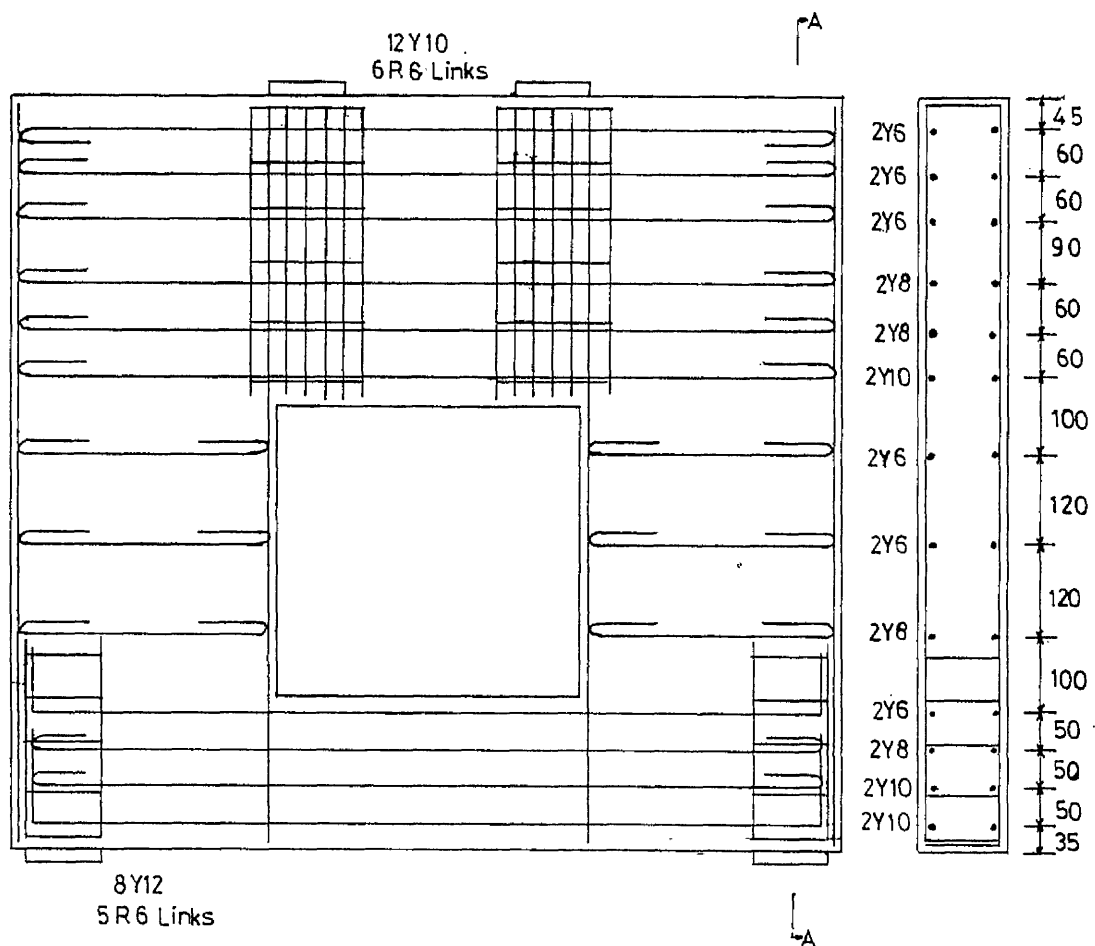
ARRANGEMENT OF REINFORCEMENT FOR BEAM B4. SECTION A-A.
